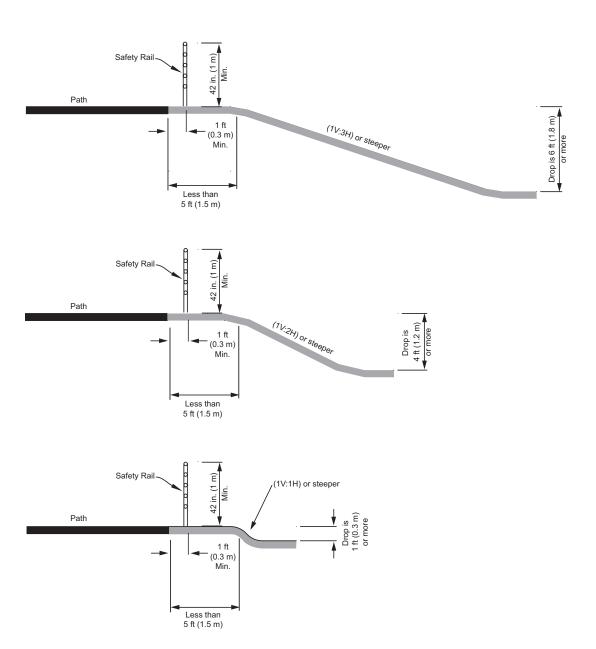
Safety Rail Between Path and Adjacent Slope
